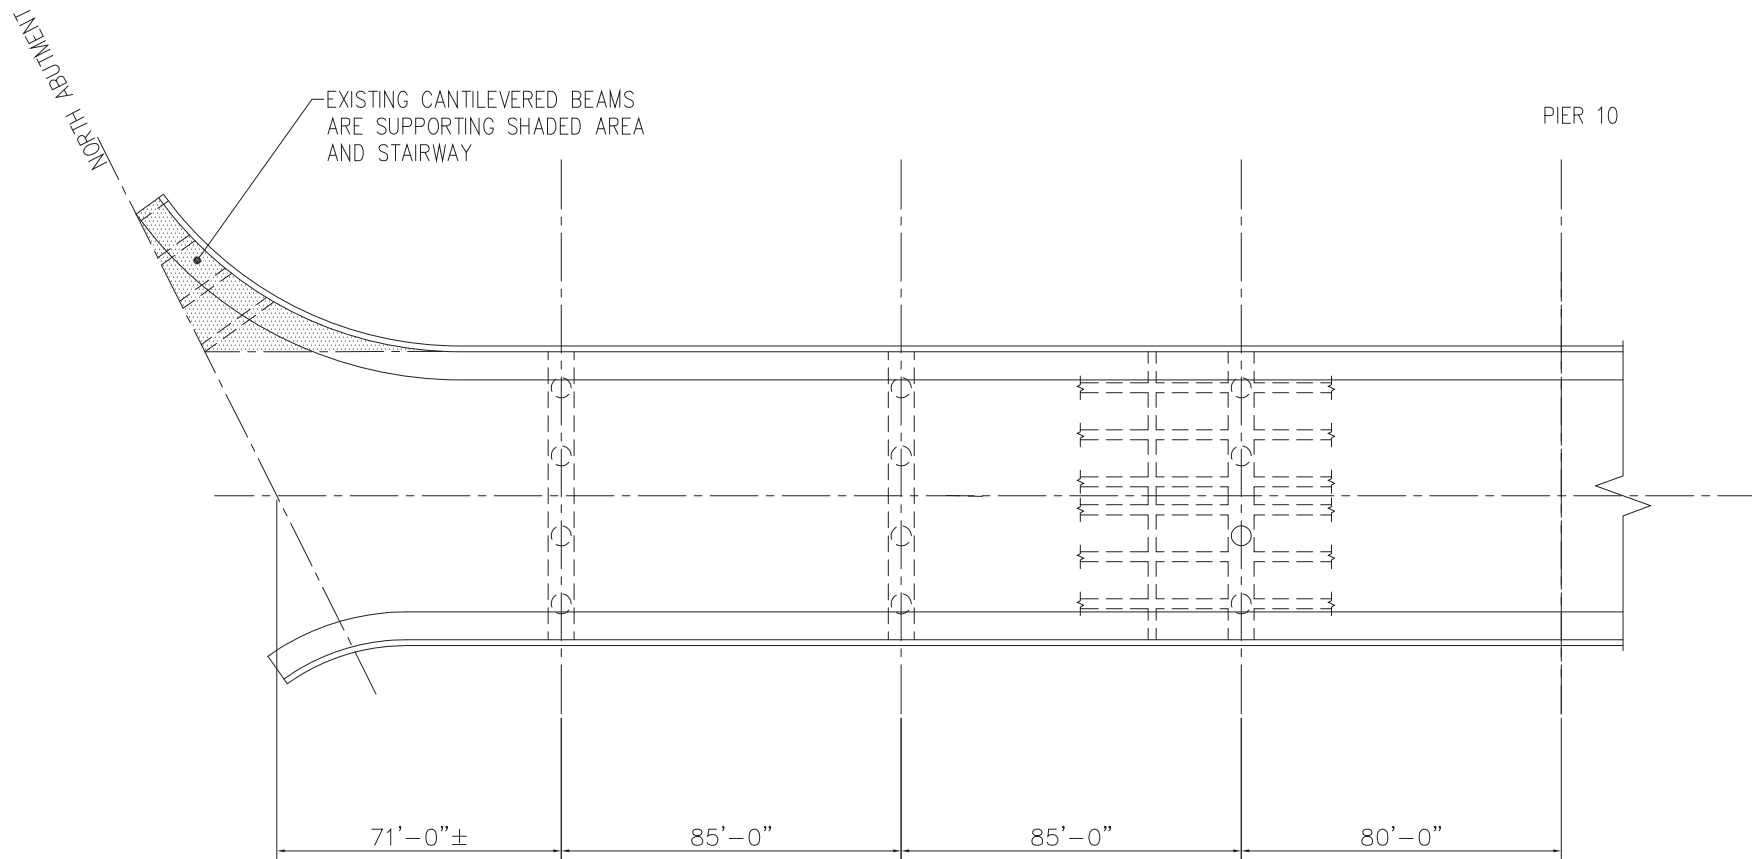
FOUR SPAN CIP CONCRETE DECK PLAN
